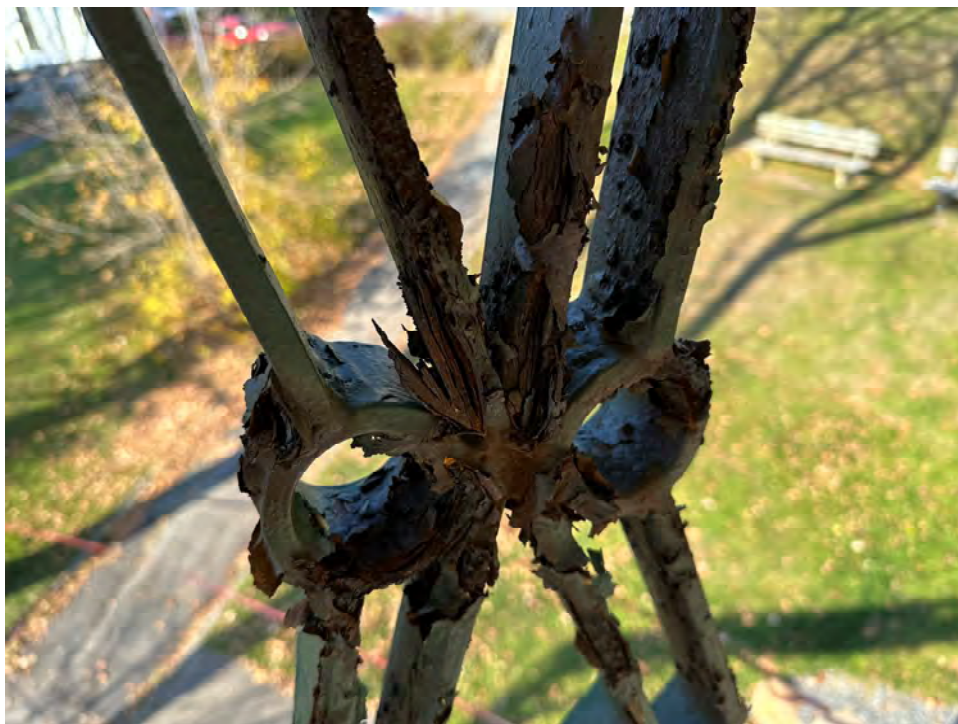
Peeling paint and corrosion on ornamental steel brackets
